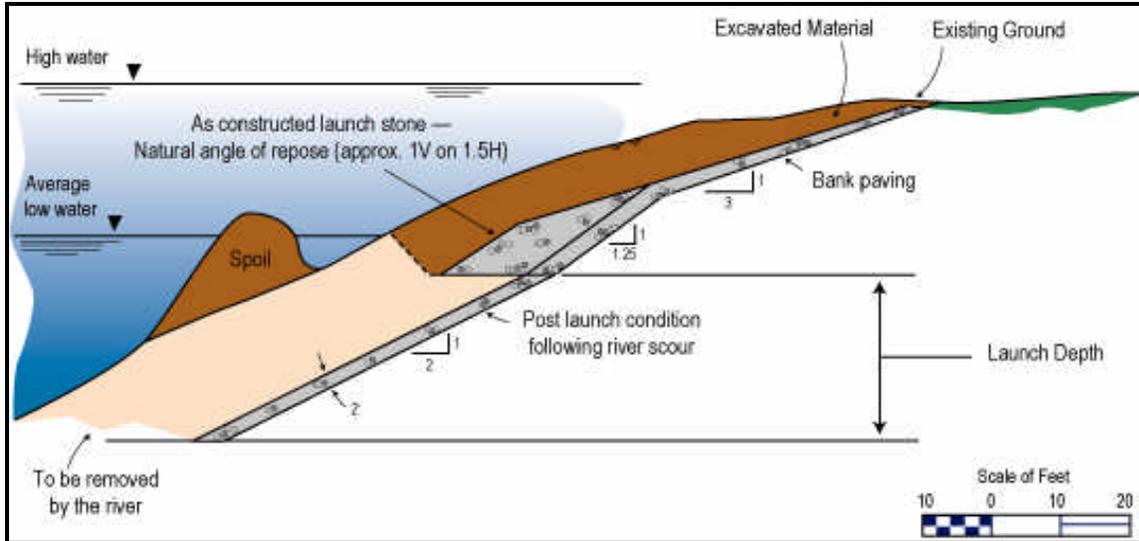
Typical Cross Section of a Trenchfill Revetment
